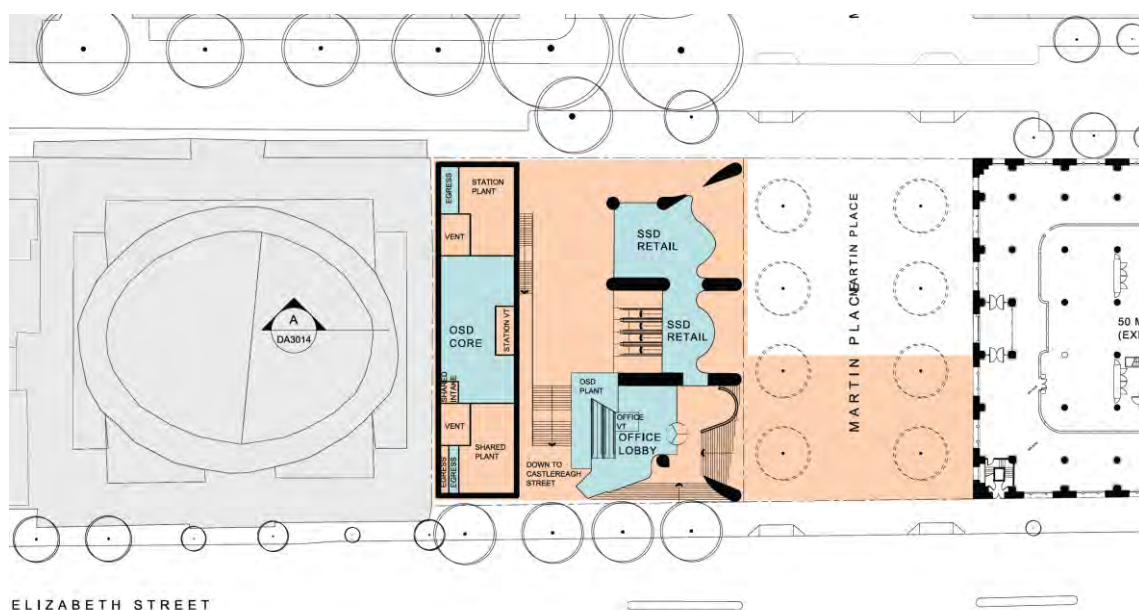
Ground floor CSSI / SSD Demarcation Plan, South Site
